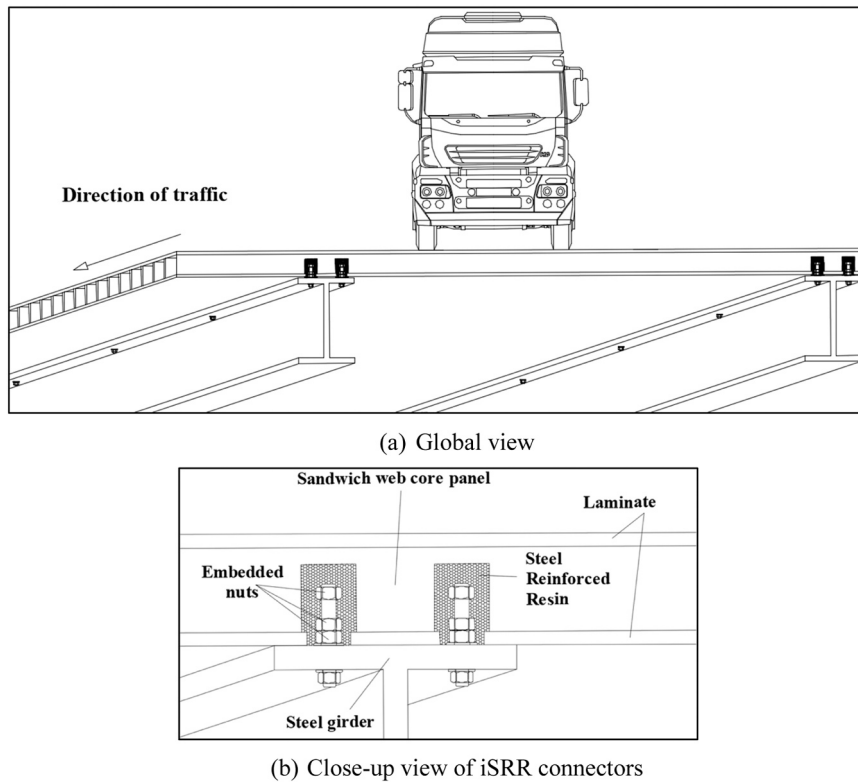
Cross section of a bridge with iSRR bolted connections between composite deck panel and steel girder.
